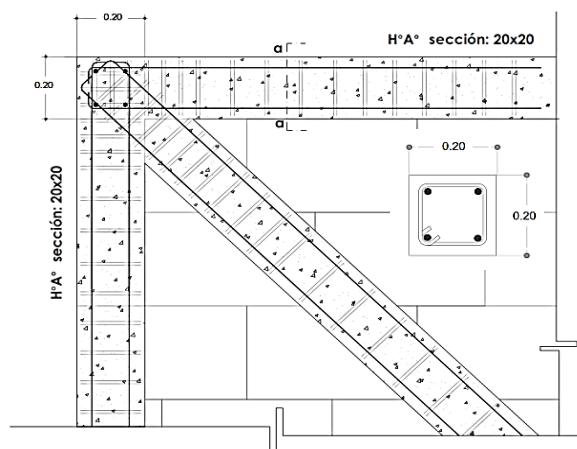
Detail: Armed union with upper beam column and diagonal brace for model M4A.
